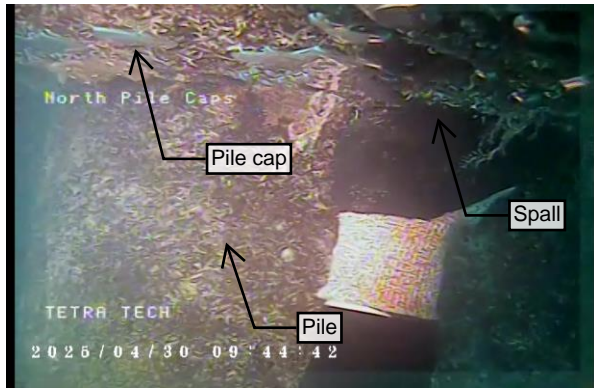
Pile to pile cap connection with hand in spall
